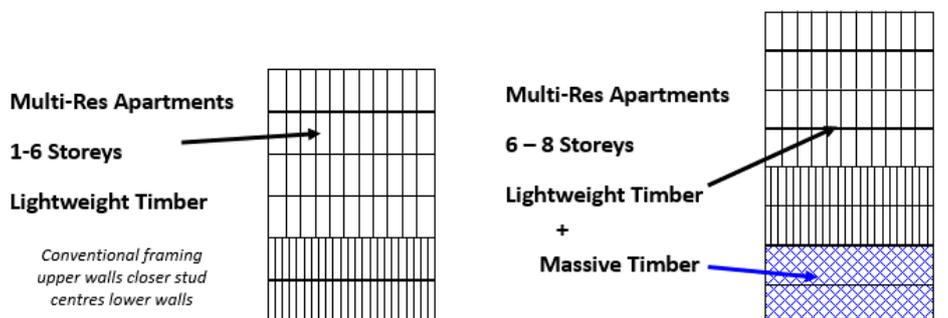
Wall framing approaches in 6-8 storey buildings
